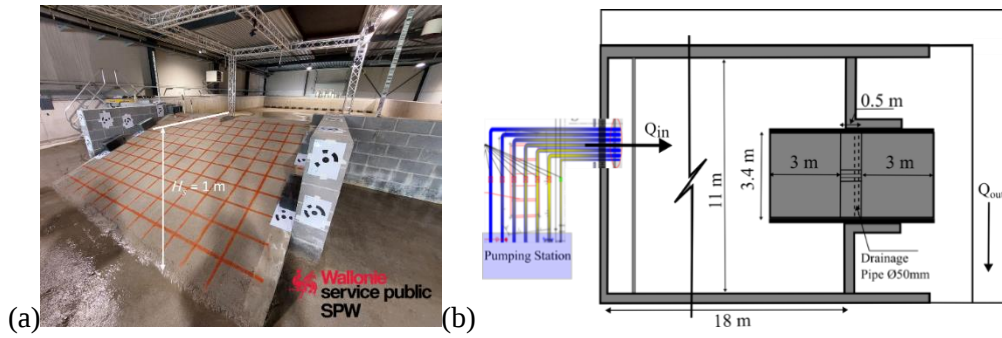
Experimental setup: (a) Test platform and embankment and (b) Plan view of embankment, upstream and downstream reservoir (not to scale).
